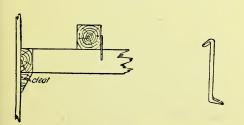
Elevation of Struts Fig. 62.—Wrought and Waling. Iron Dog.
